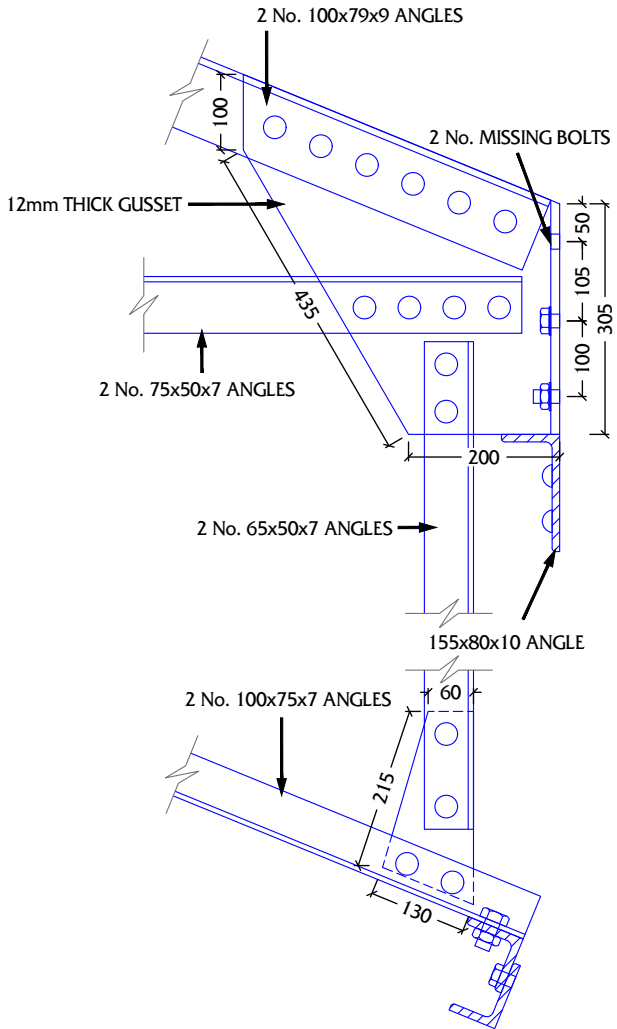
PART ELEVATION LOOKING SOUTH SHOWING DETAILS OF PARTIALLY EXPOSED ROOF TRUSS END CONNECTION - SURVEY AREA K3 SCALE 1:10
